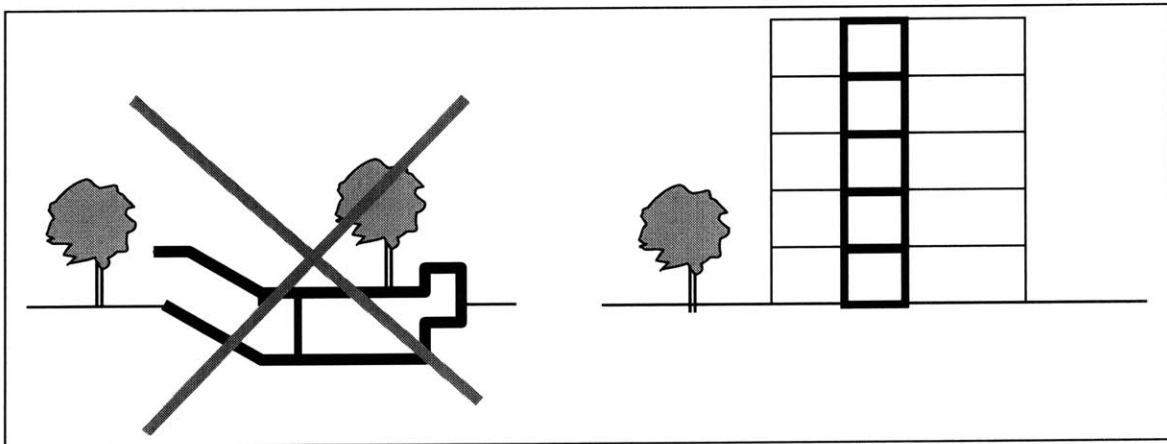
The change from underground shelters to protected spaces (Einstein, 2003).
